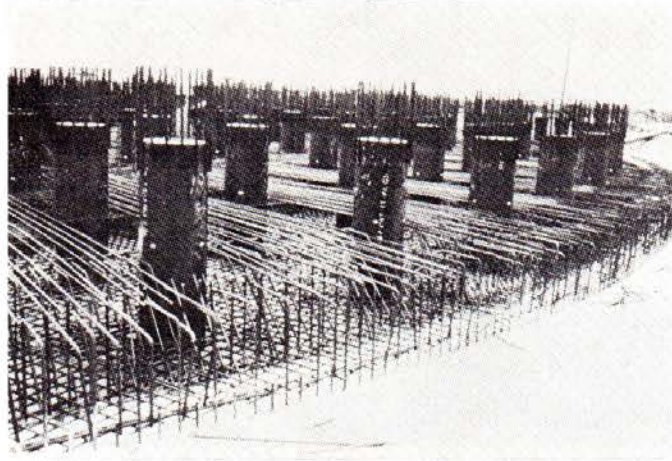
Pile foundation to support a liquified natural gas reservoir tank.
